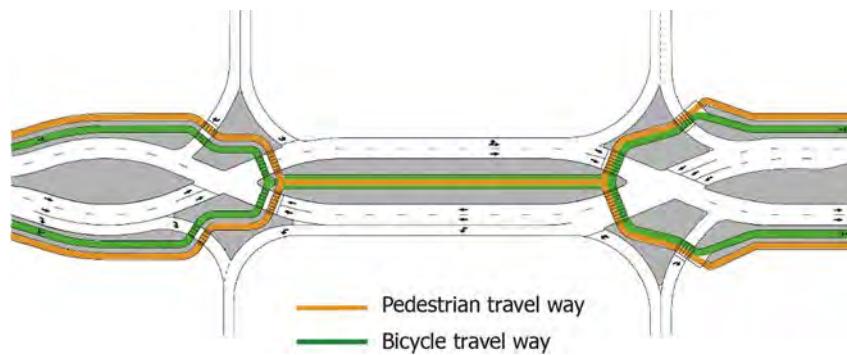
DDI separated bike lane/inner walkway design concept.
